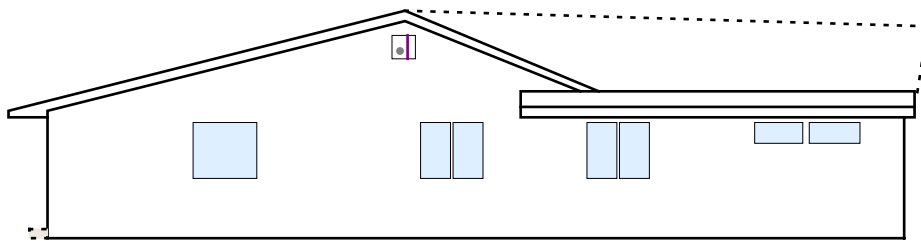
Elevation view existing house viewed from inside from east looking west. Southern most window (to the left in the diagram) is in the addition. New roof line (solid line) runs from the roof peak to the south. Old north roof line (dotted) is in the middle of the occupied (non-carport) north part of existing house.
